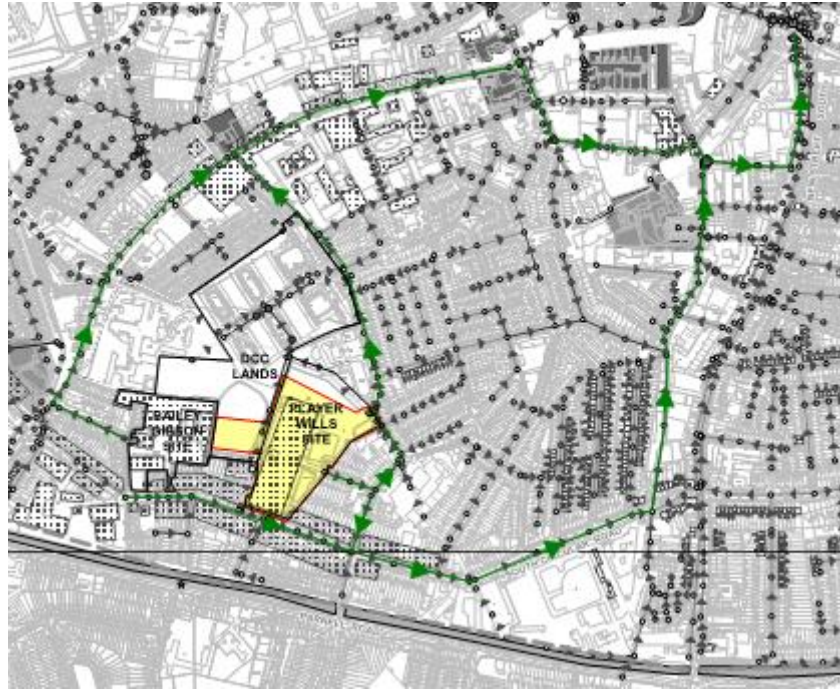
EXISTING SEWER LAYOUT SURROUNDING THE SITE (EXTRACT FROM GDSDS)
